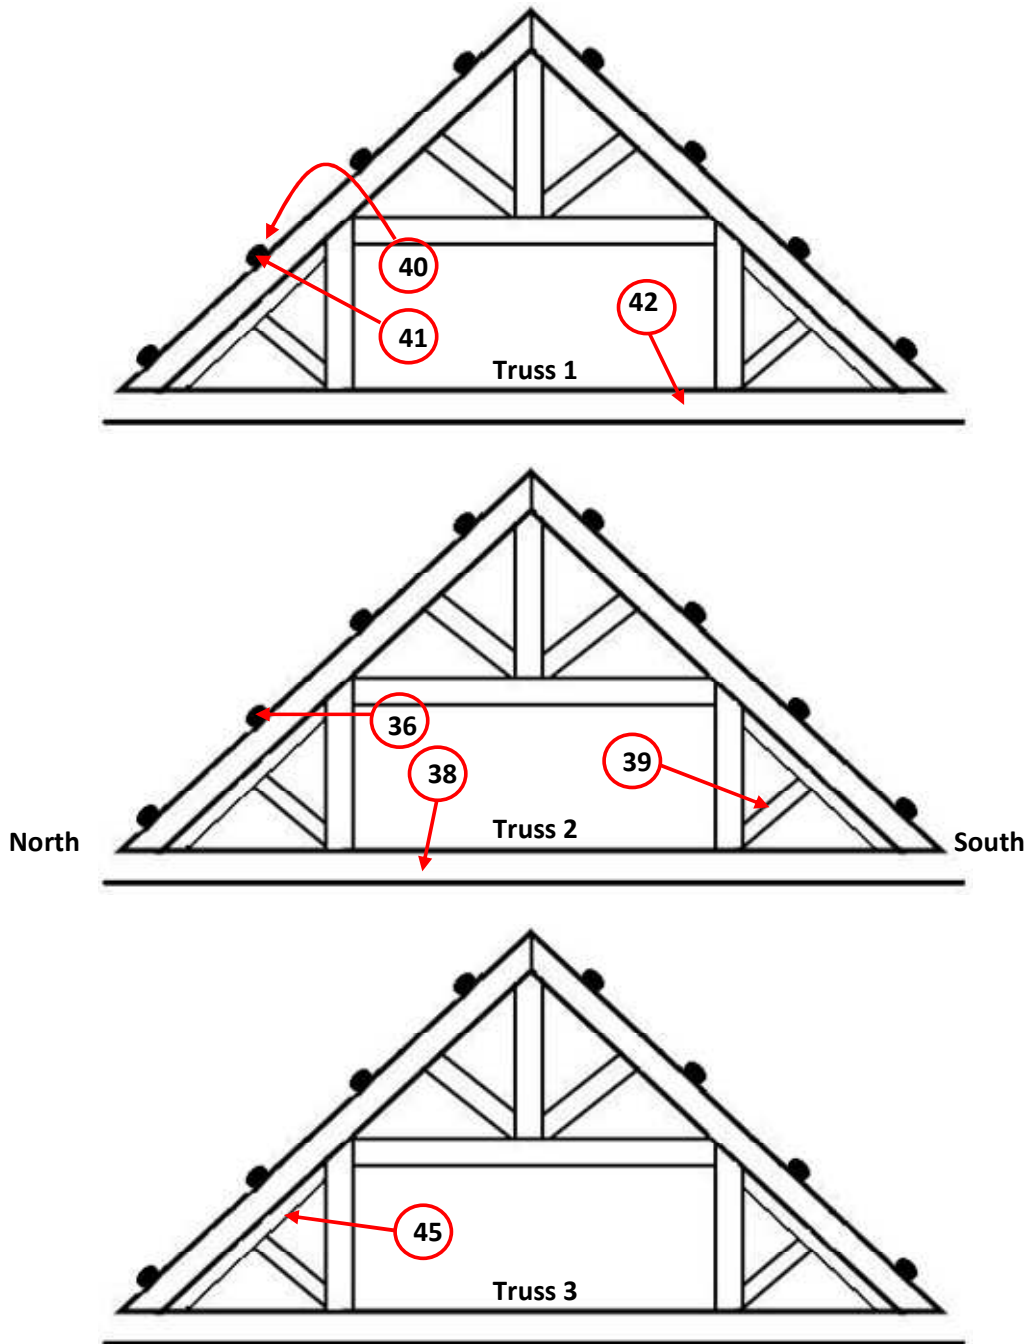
Schematic plan of the north roof of the Keep to locate sampled pine timbers
